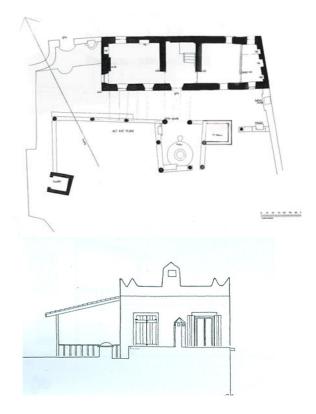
, Plan and facade of a Sakız-type house (Bektaş and Başak, 2004, 88-89)
